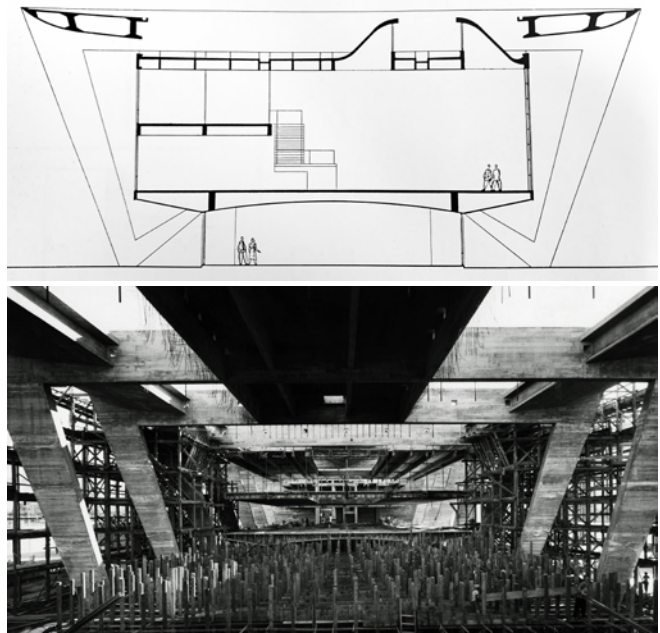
The hollow reinforced concrete slab design used in MAM was tested in the Gavea Housing Development. At the plane of the frames the floors have a solid section. Construction images indicated there may be vertical supports throughout the hollow portions. Top image: (Klaus 1960), bottom image: Aertsens Michel.
